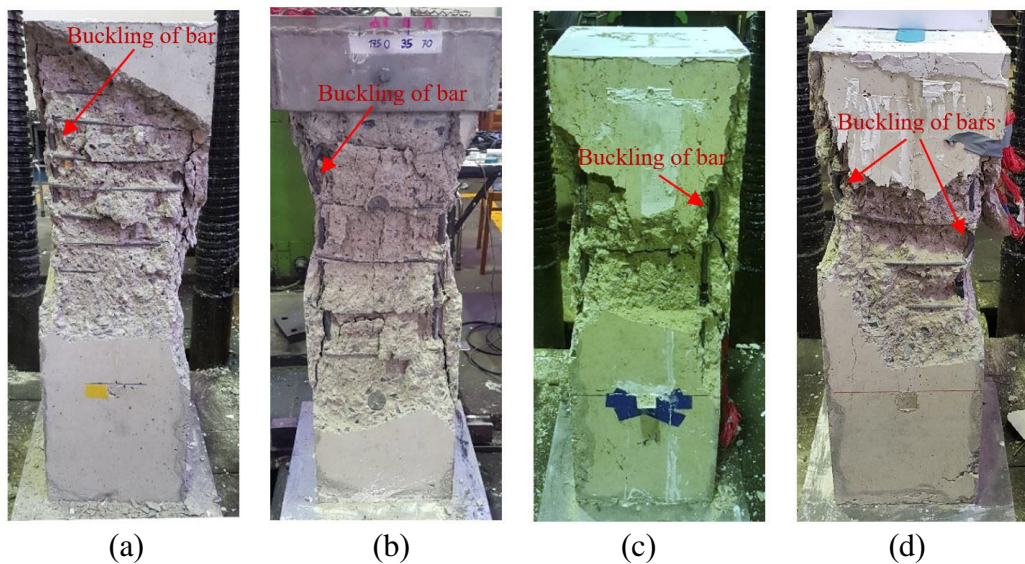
Failure of composite columns with different stirrup spacings after removal of spalling concrete (a) W-63; (b) C1-126; (c) C2-170 (A); and (d) C3-108.
